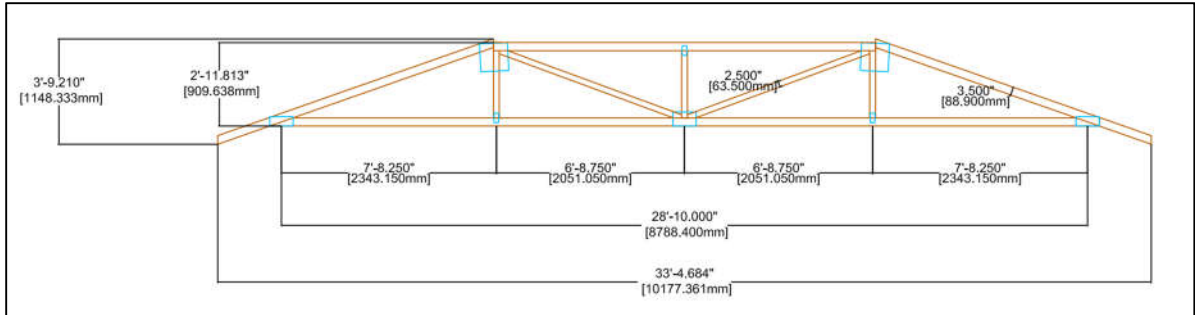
Dimensioned drawing of hip roof Truss A2 from the full-scale house tested at the Insurance Research Lab for Better Homes
